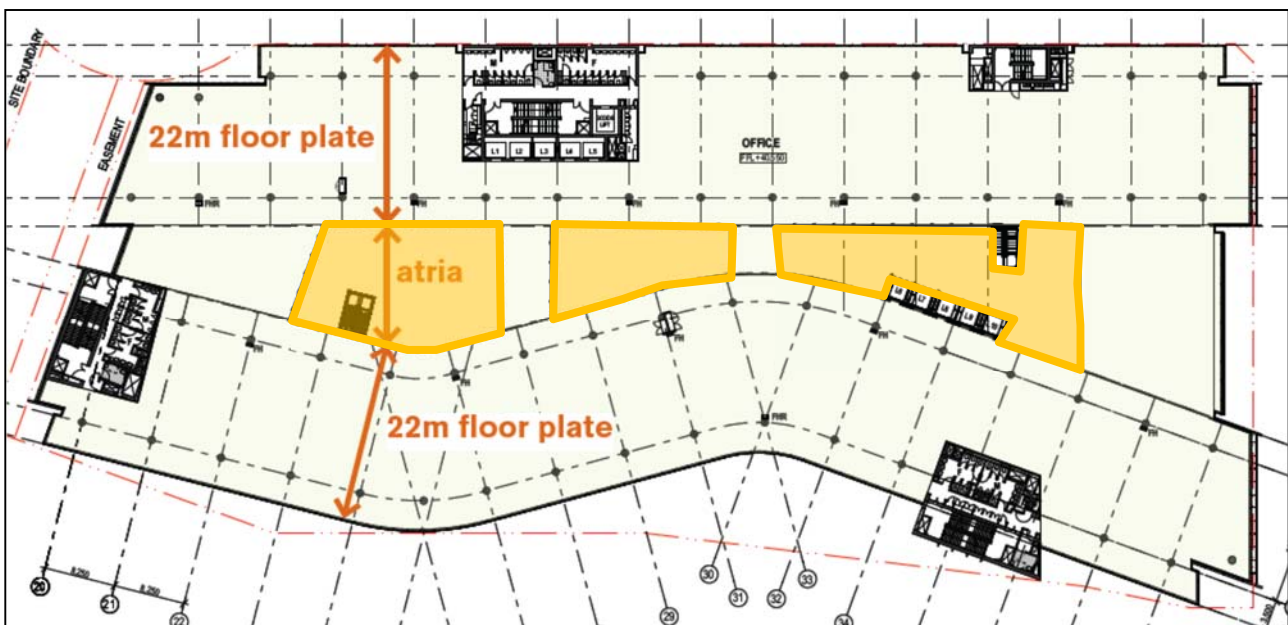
Typical commercial floor plan of Building 1 showing atria in orange (Source: applicant's RTS)
